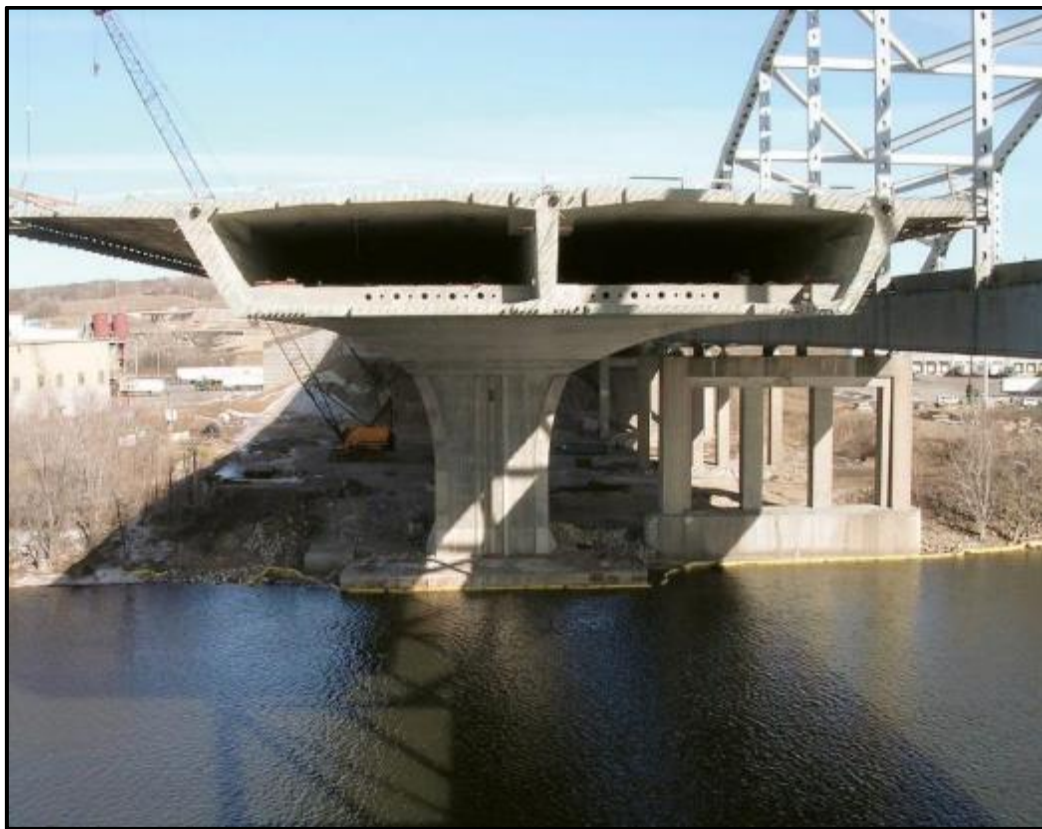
1: Application of hollow beam in Wakota Bridge American Segmental Bridge, (2005)
